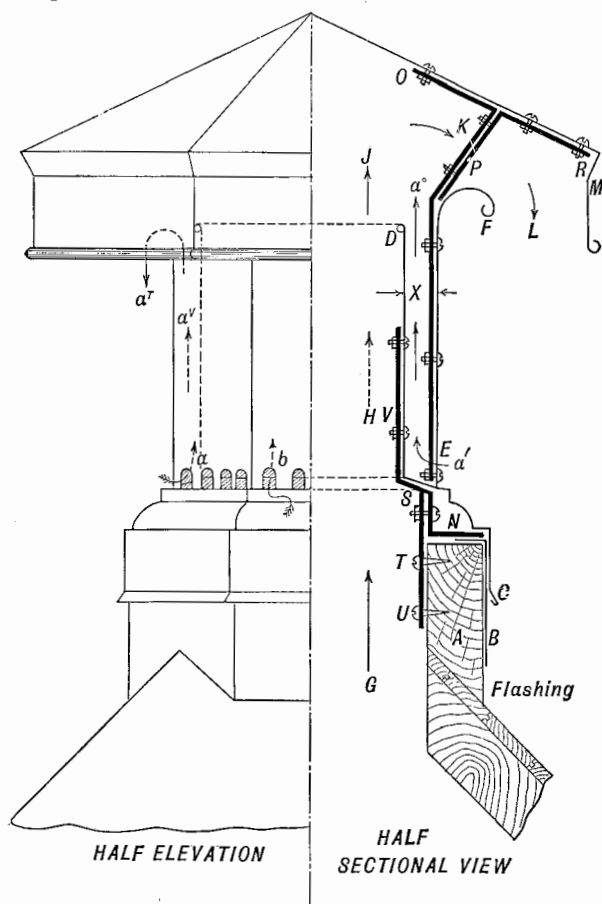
Method of Constructing and Fastening Large Ventilator on Wooden Curb
